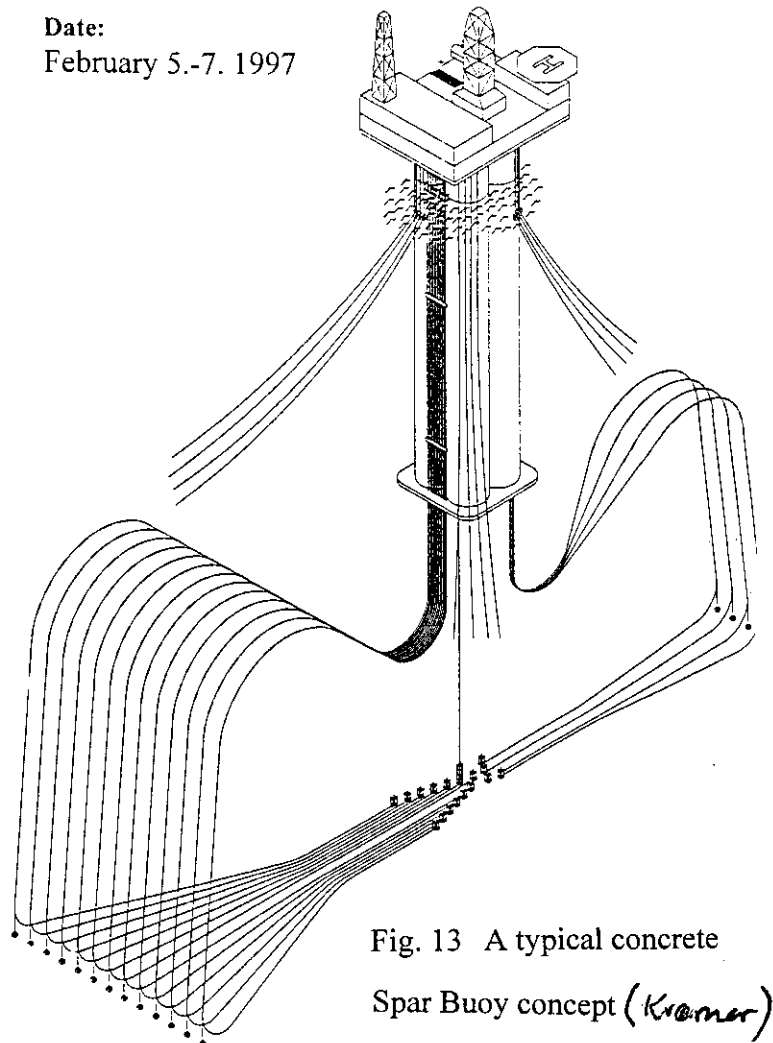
A typical concrete Spar Buoy concept (Kvaerner)
